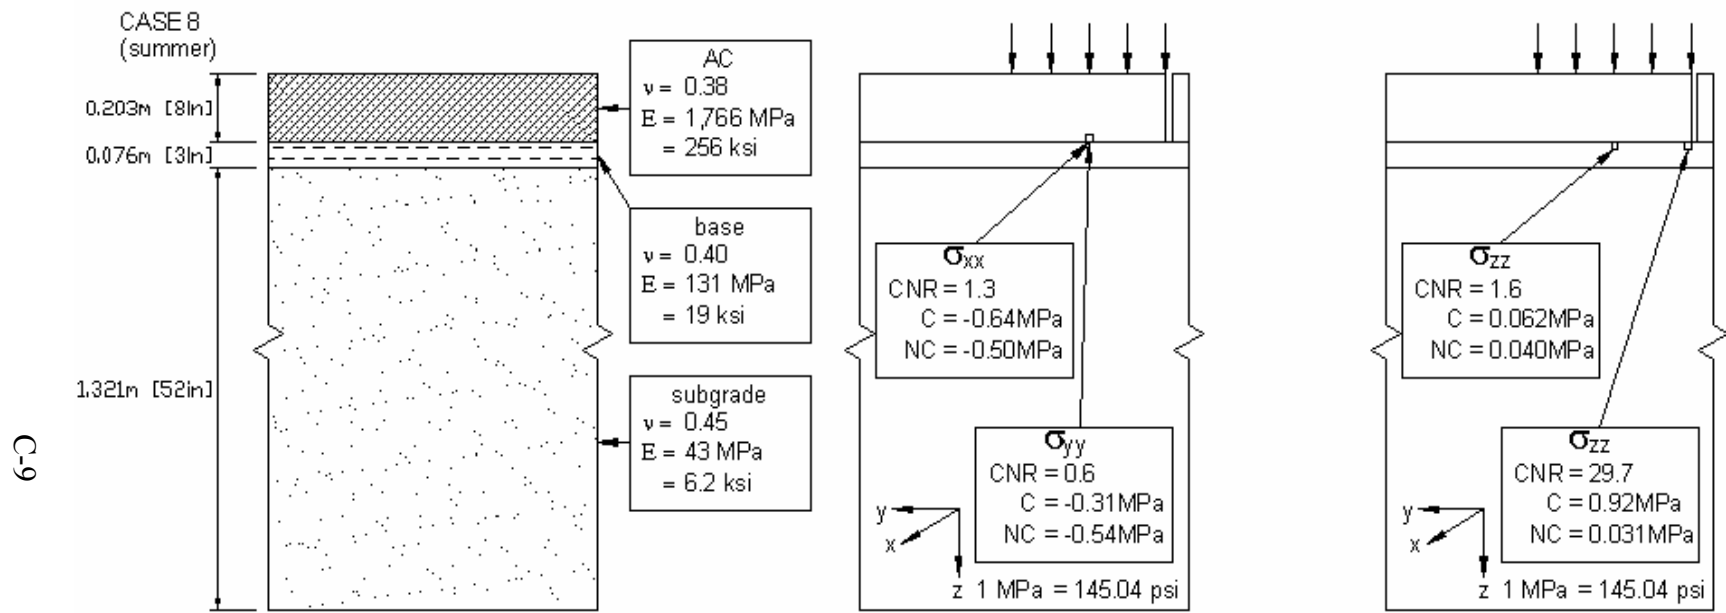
Summary cross section for case 8, (C – stress in cracked pavement, NC – stress in pavement with no crack, CNR – crack/no crack (stress) ratio)
